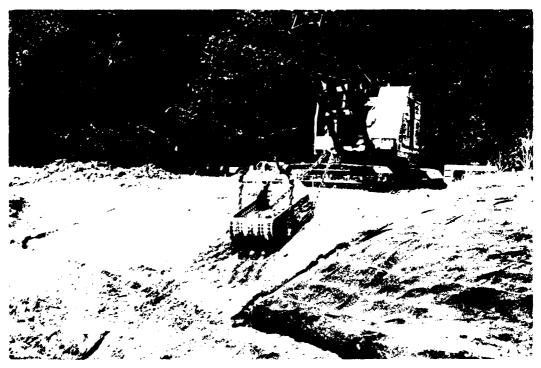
View of dragline excavating soil from bank area in Items 6 and 7
